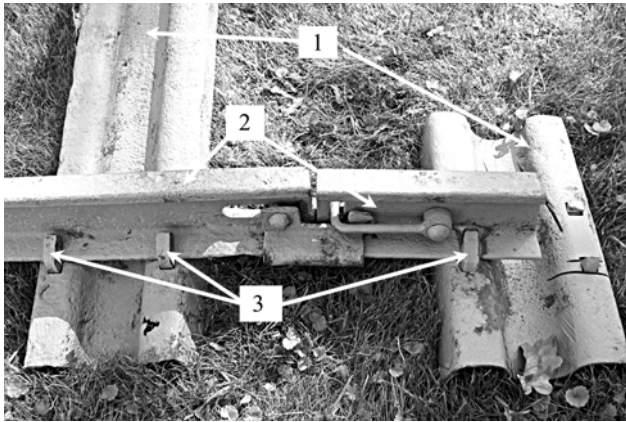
Construction of found rail: 1 – sleepers; 2 – rails; 3 – yokes of rails attaching to sleepers
